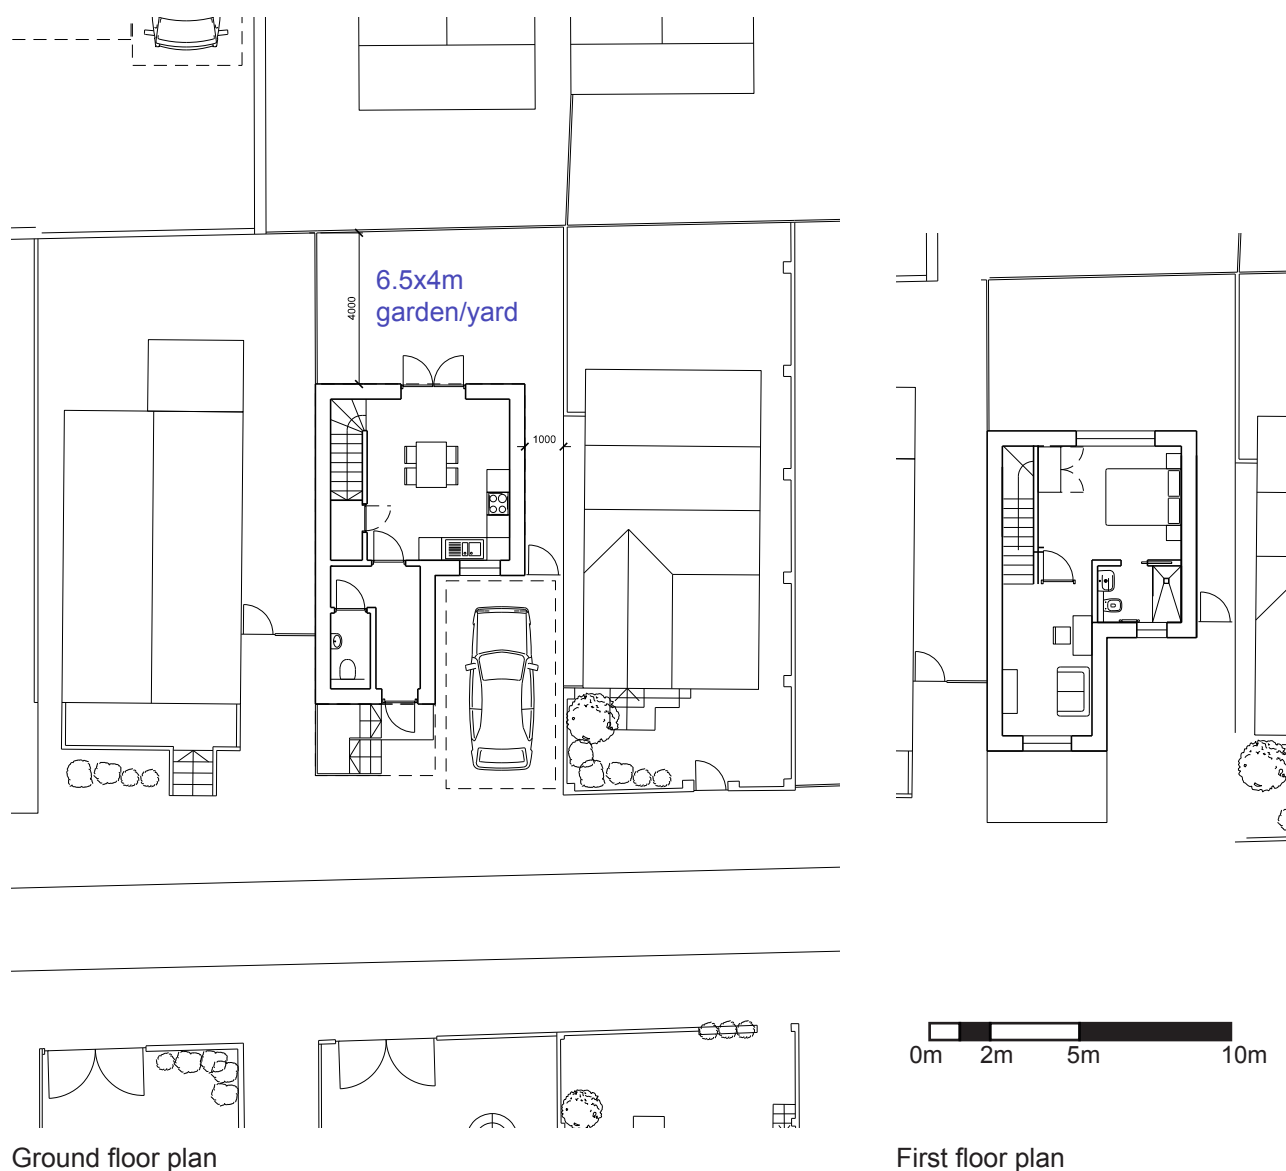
Sample 1 bedroom house plan on small Brooklands plot, demonstrating compliance with internal and external space standards and a 10m garden.
